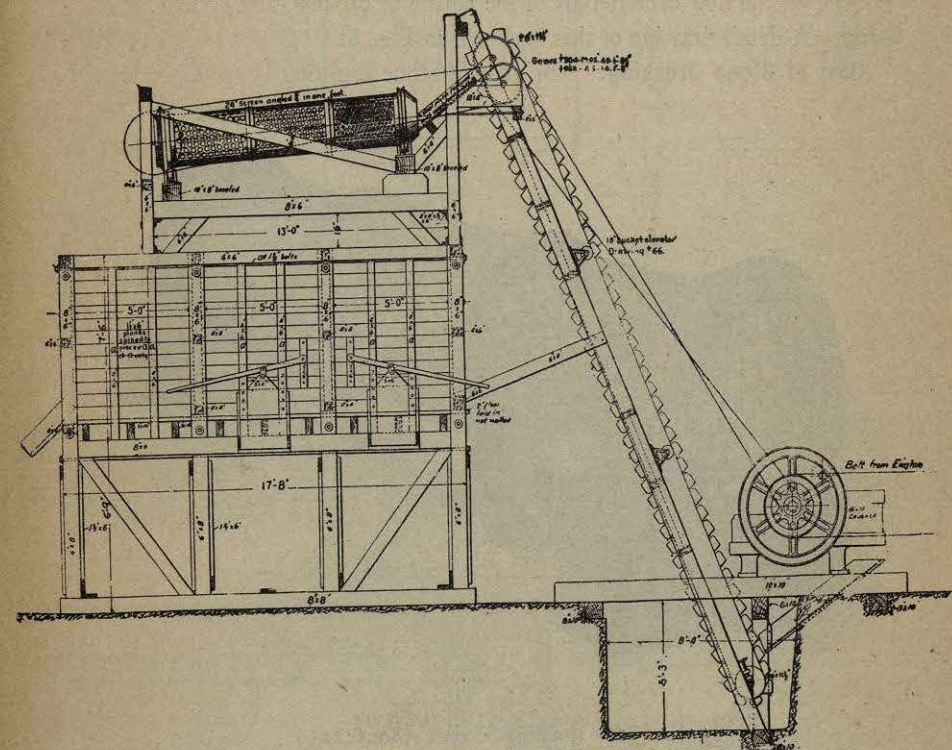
Small Crushing Plant with Elevator, Screen, and Portable Bins. (See p. 245.)
